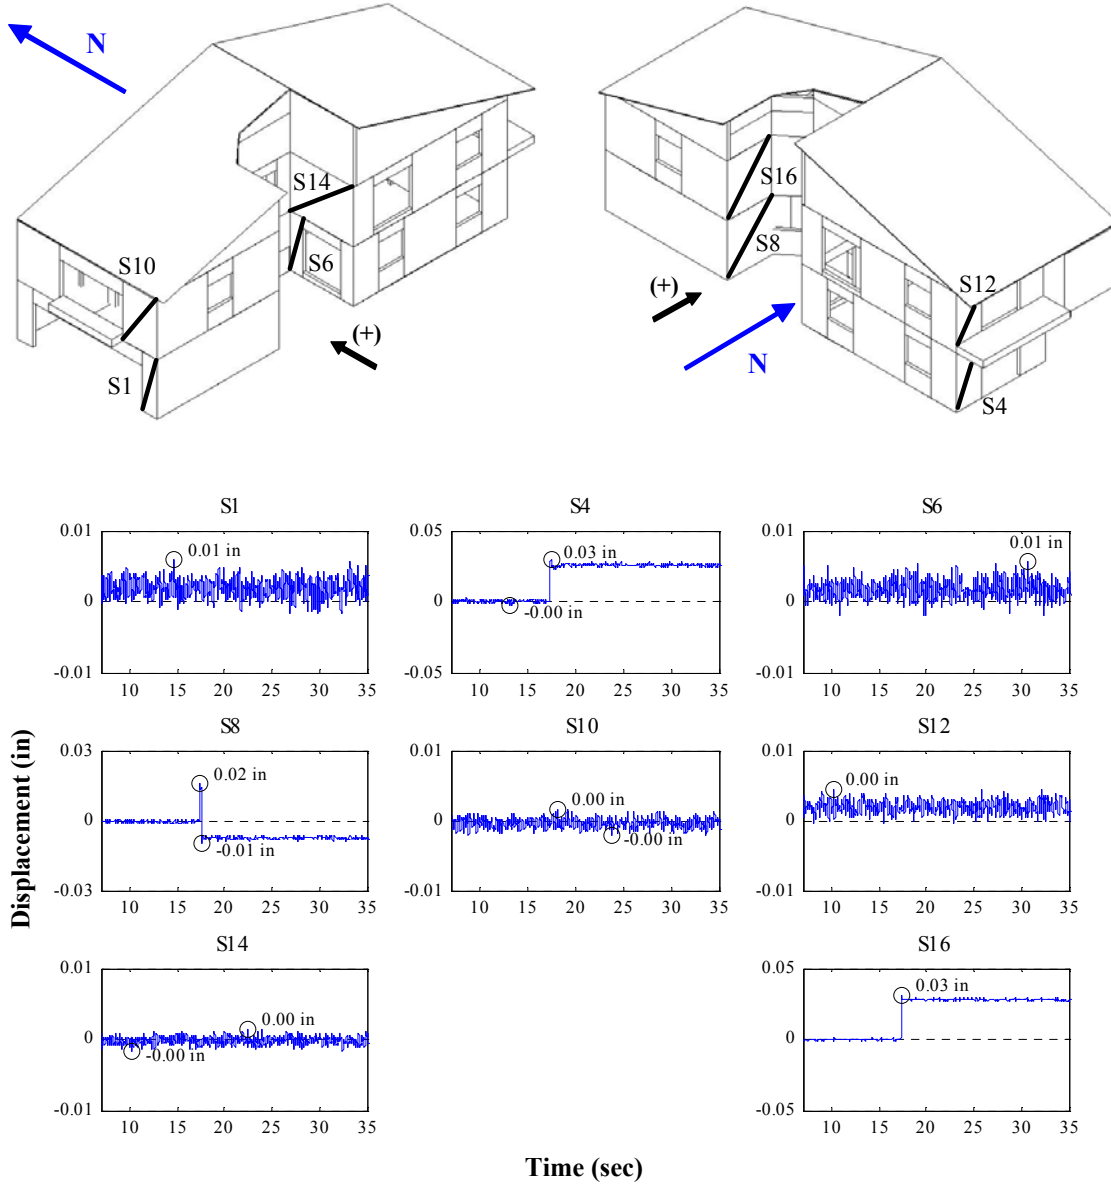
Wall deformations of north-south external walls for Test NWP4S02
